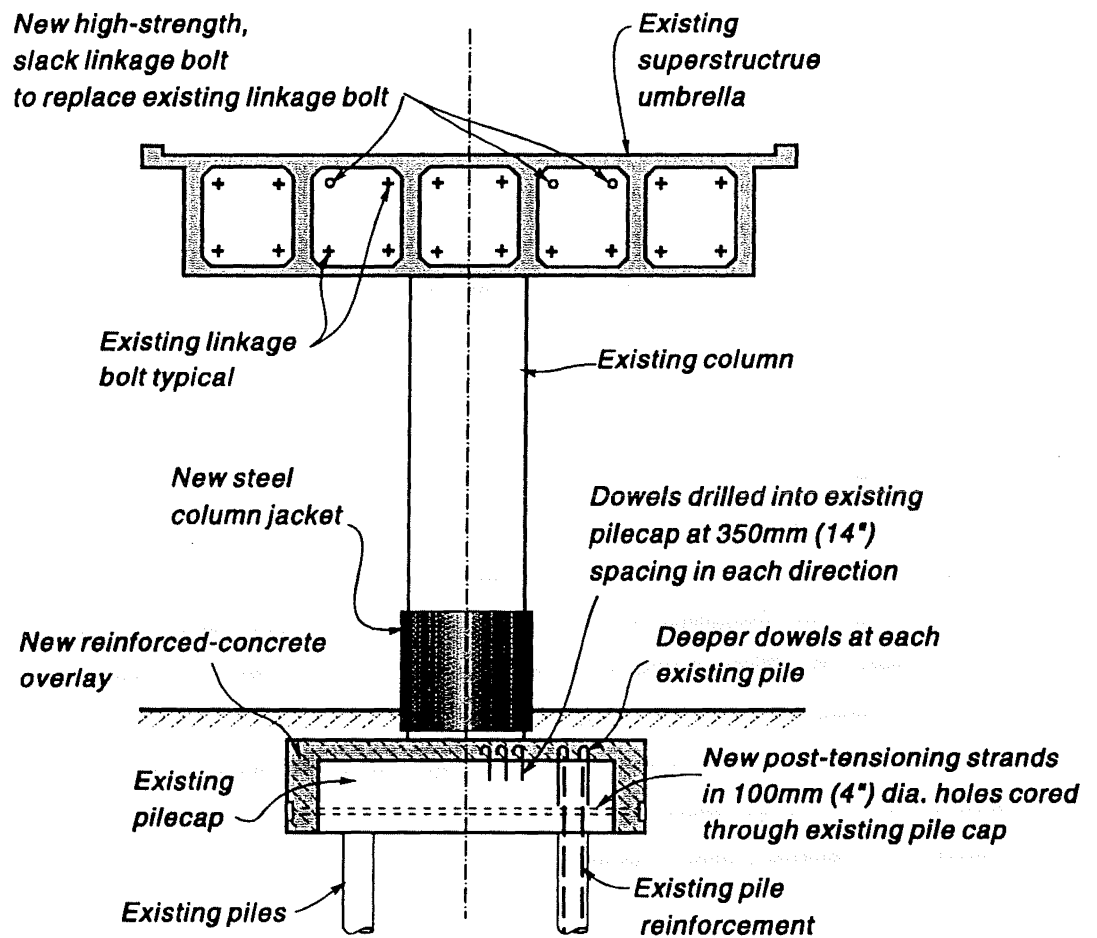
Proposed retrofit measures for a typical single-column pier.
